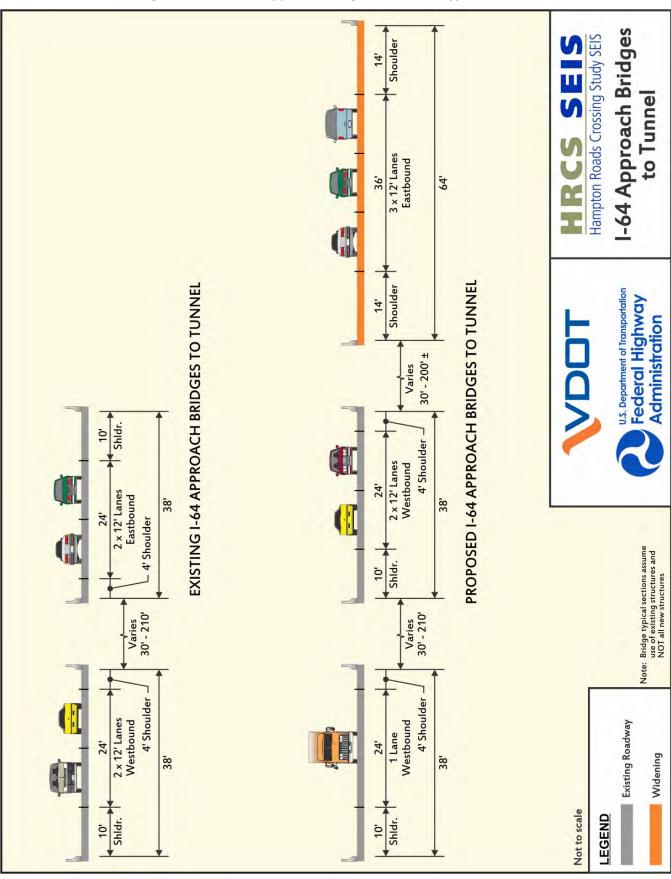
I-64 Approach Bridges to Tunnels Typical Section
